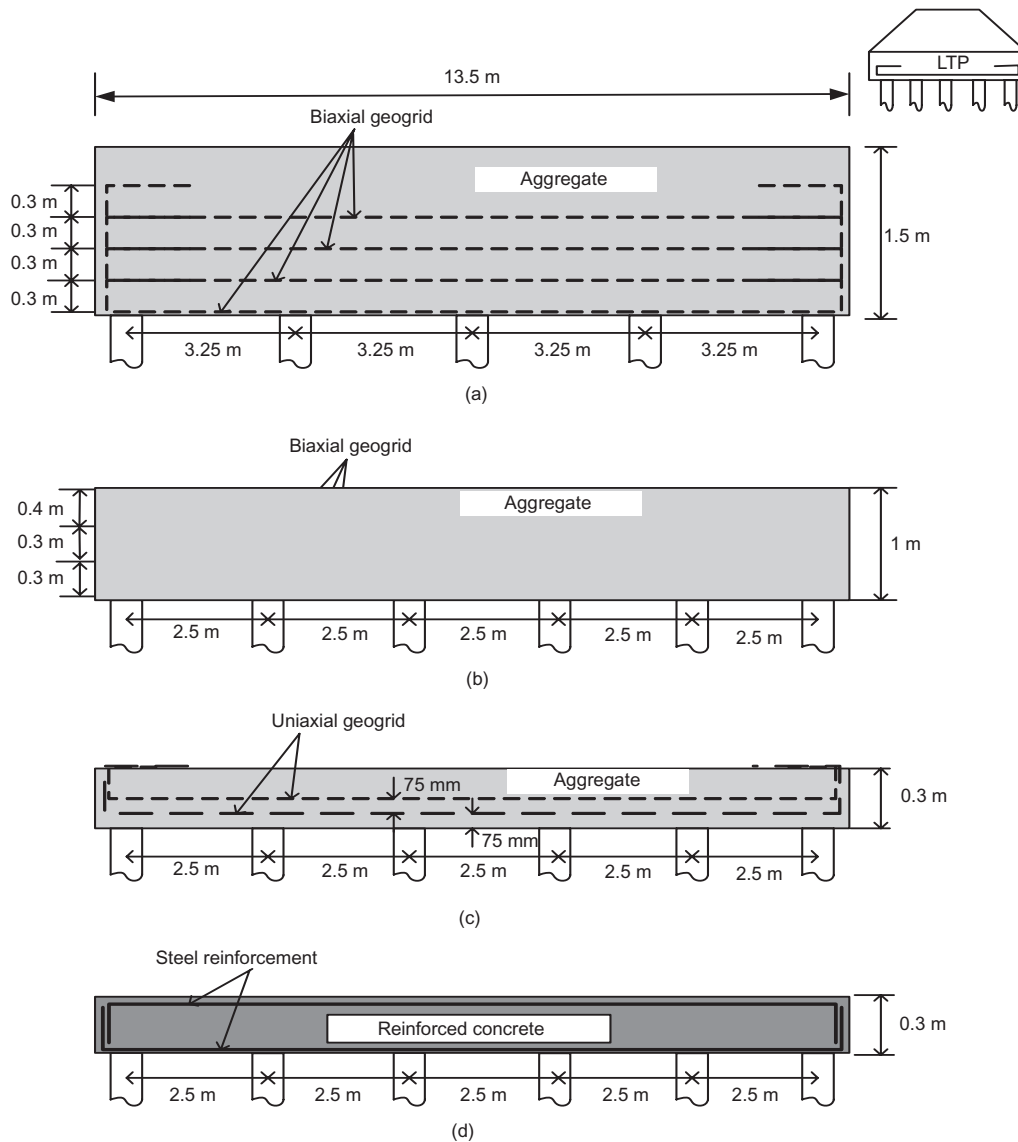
Schematic layout of the different LTPs in: (a) Section 1, beam LTP; (b) Section 2, beam LTP; (c) Section 3, catenary LTP; (d) Section 4, concrete LTP
